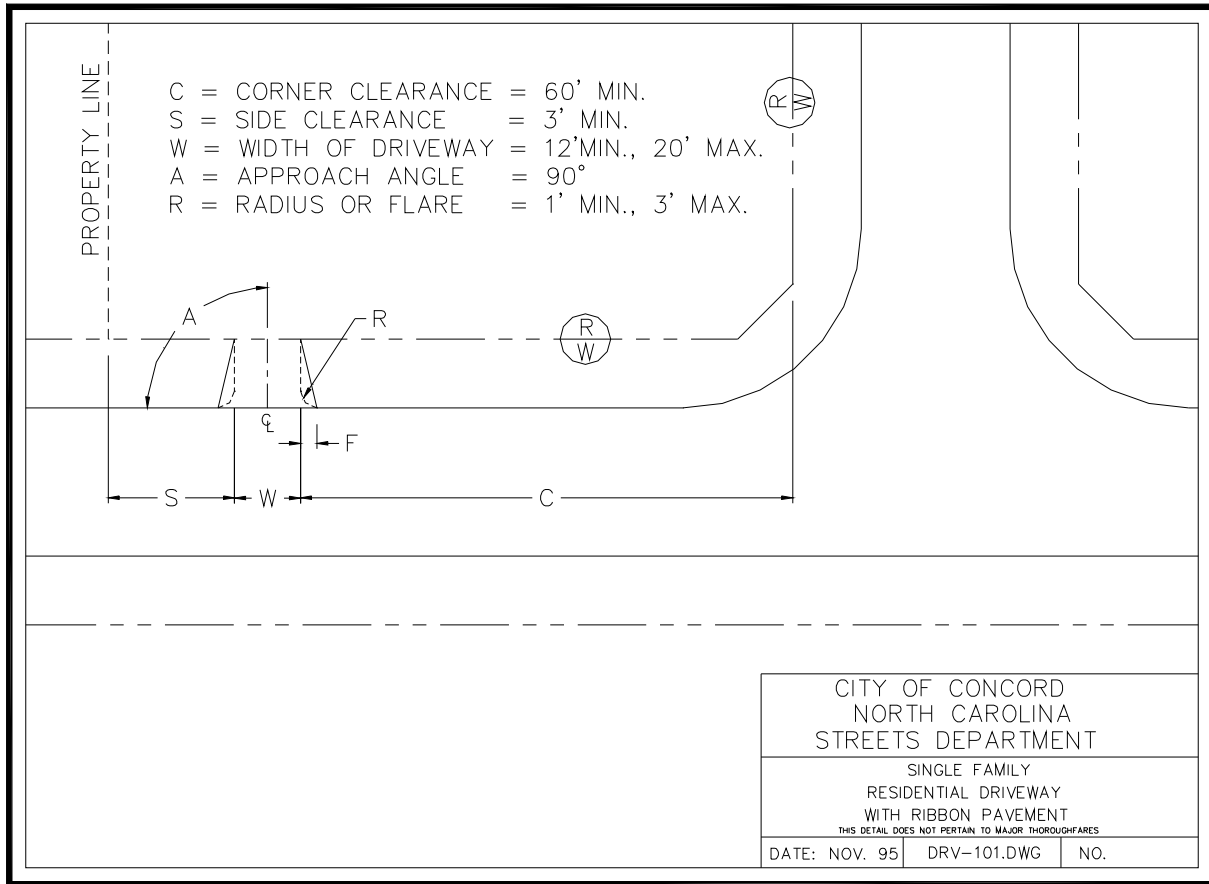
Single-Family Residential Driveway with Ribbon Pavement.
